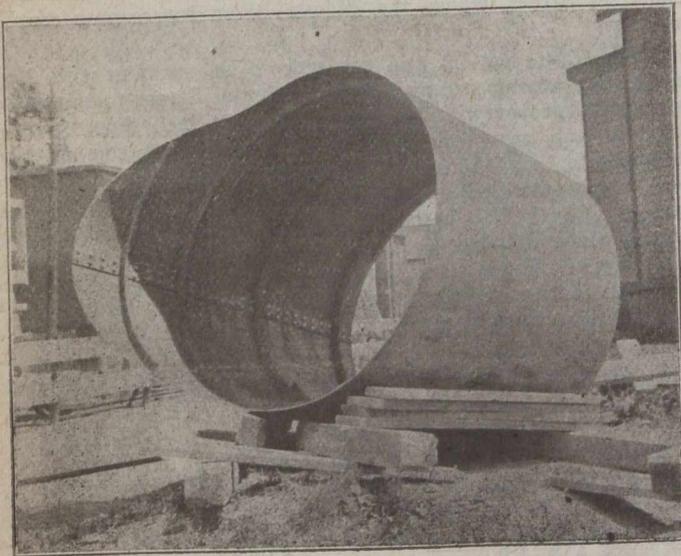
TUNNEL DRUM USED FOR 5-FT. CIRCULAR BLOCK SEWER
